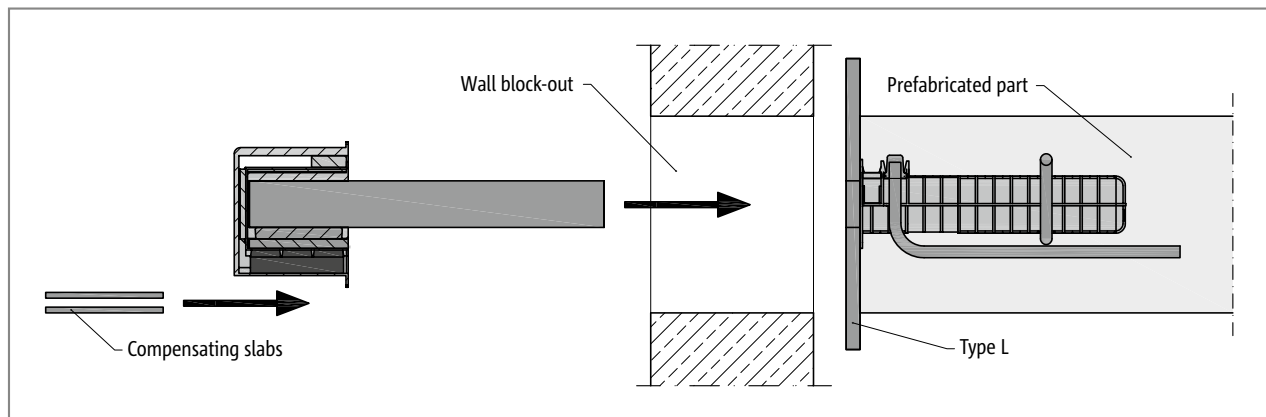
Schöck Tronsole® type Q: Wall recess with prefabricated construction
